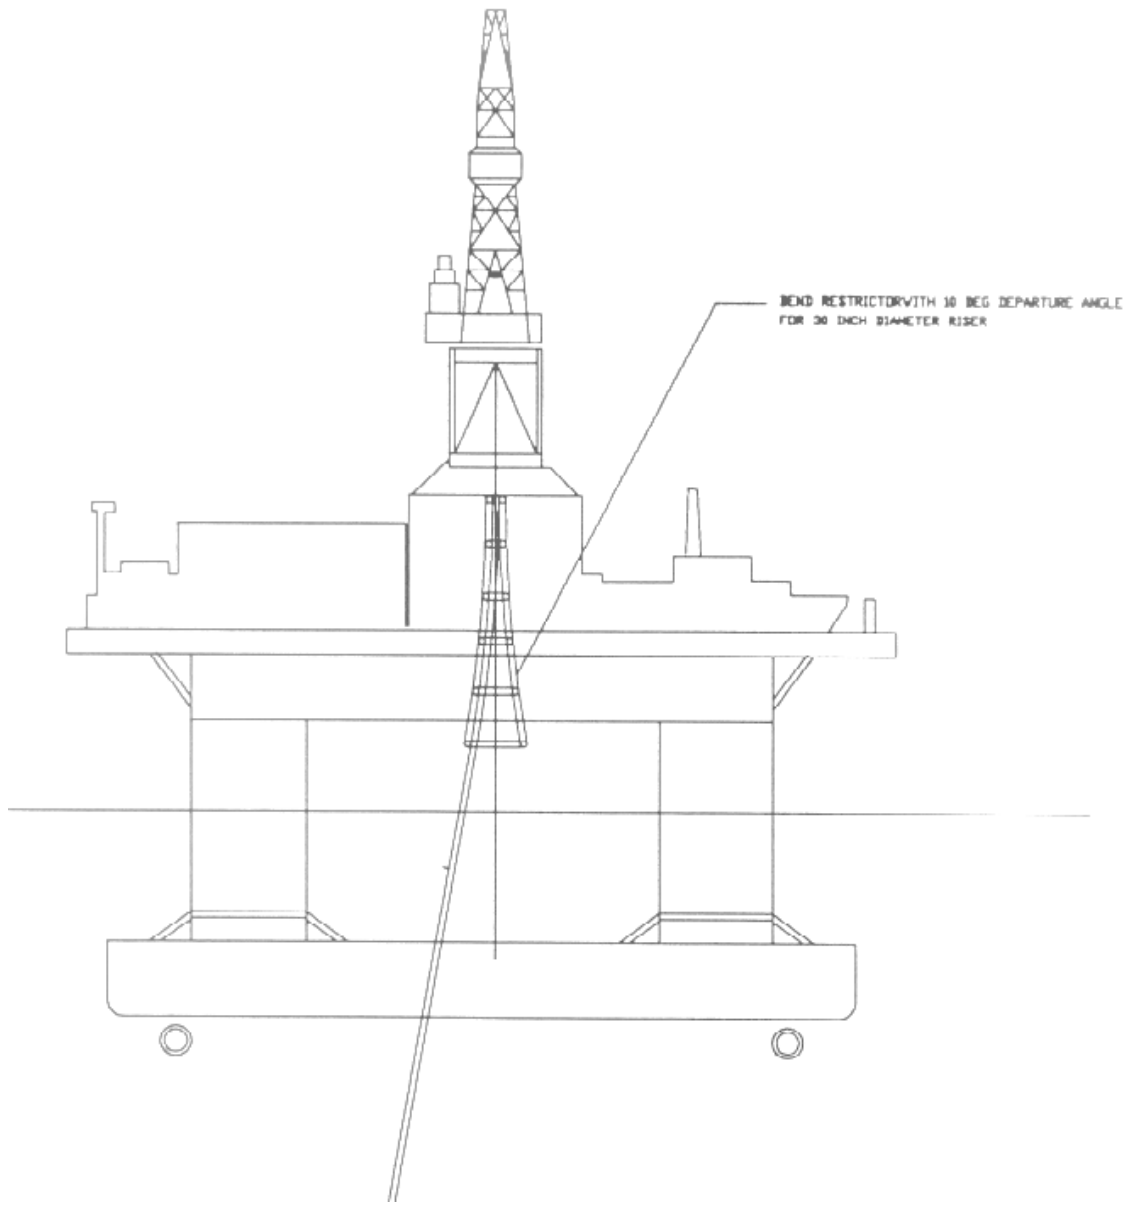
SCR Installation Stinger Fitted Below Drill Floor
